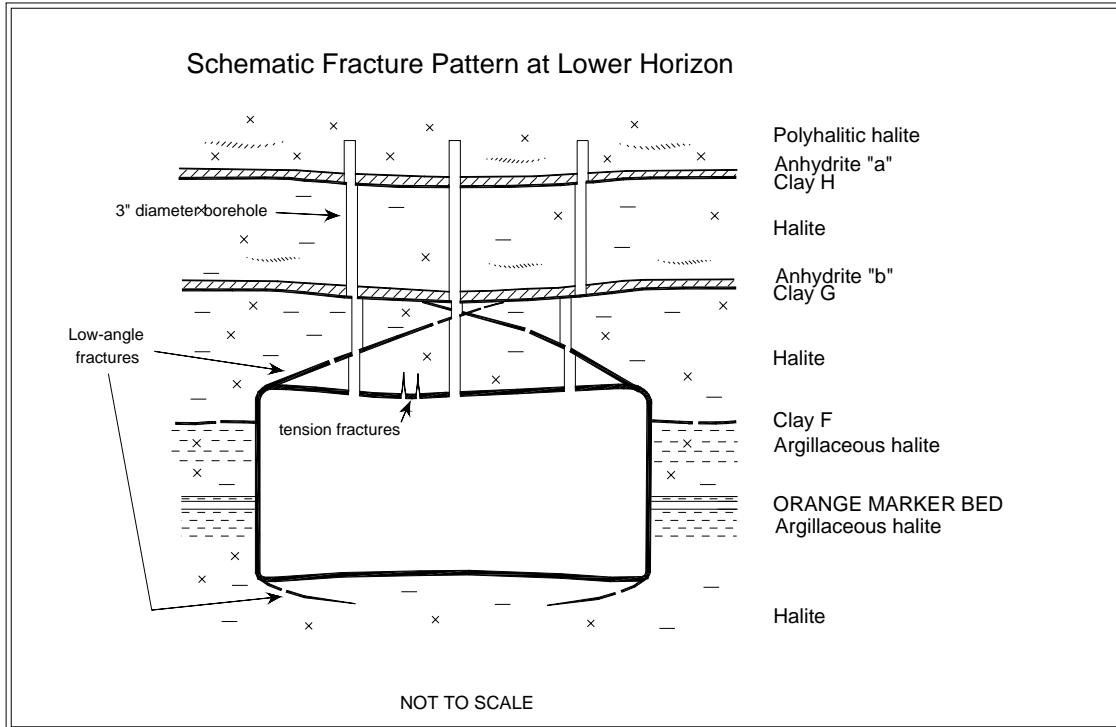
Typical Fracture Patterns at Lower Horizon
